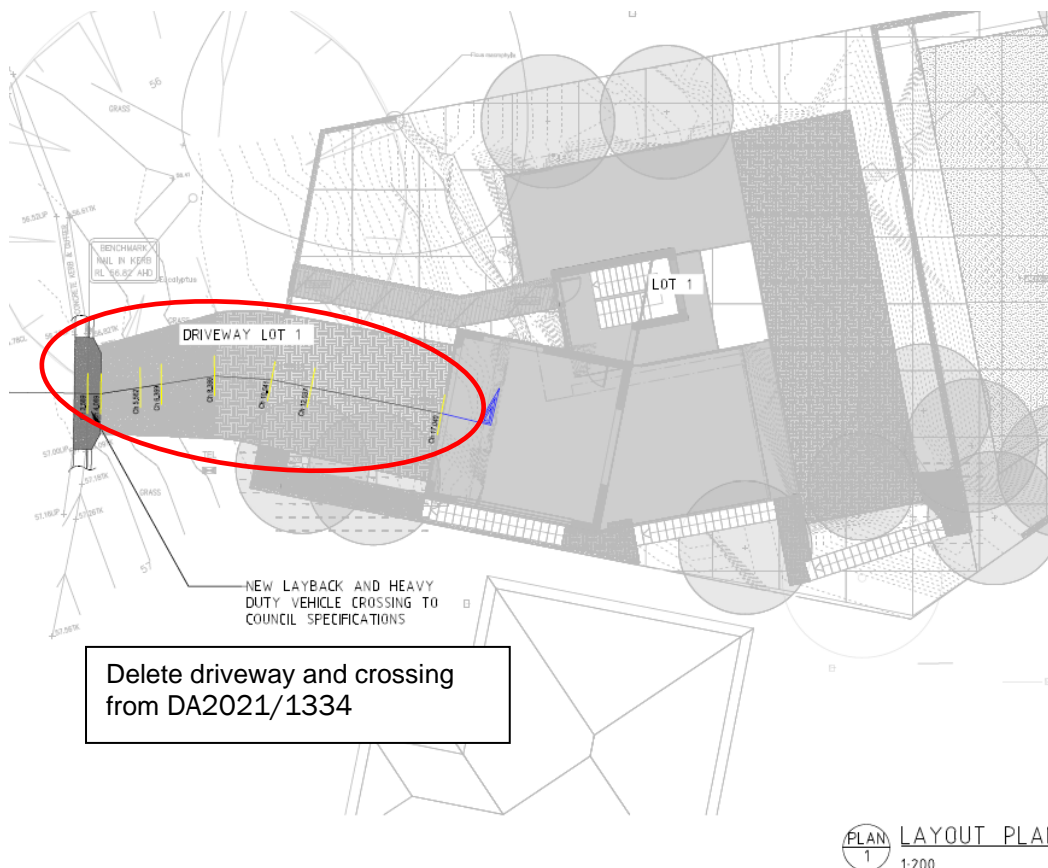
excerpt of the approved driveway layout plan CV-100 showing approved Lot 1
